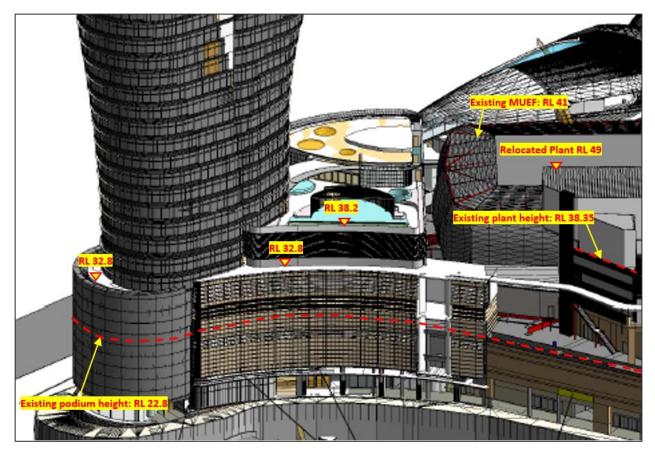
| Axonometric view showing the height of podium elements on the Jones Bay Road frontage (Base source: Proponent's Architectural drawings)
